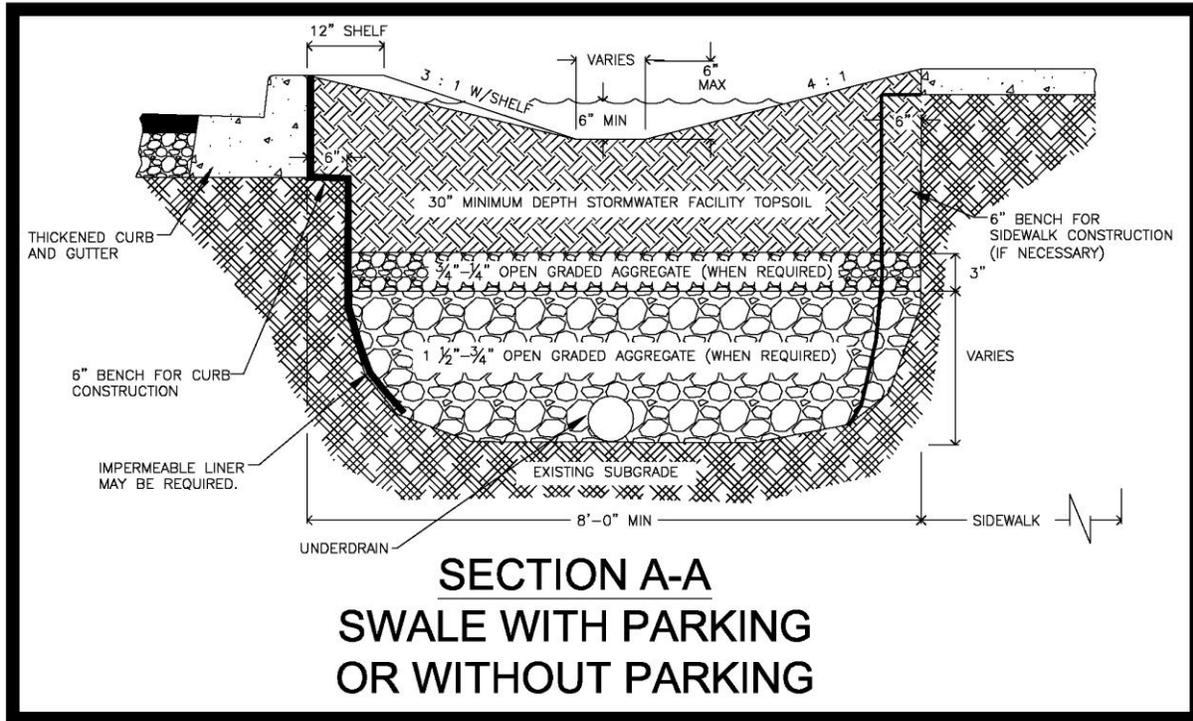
Green Streets Swale Section View (source: Portland, 2011)
